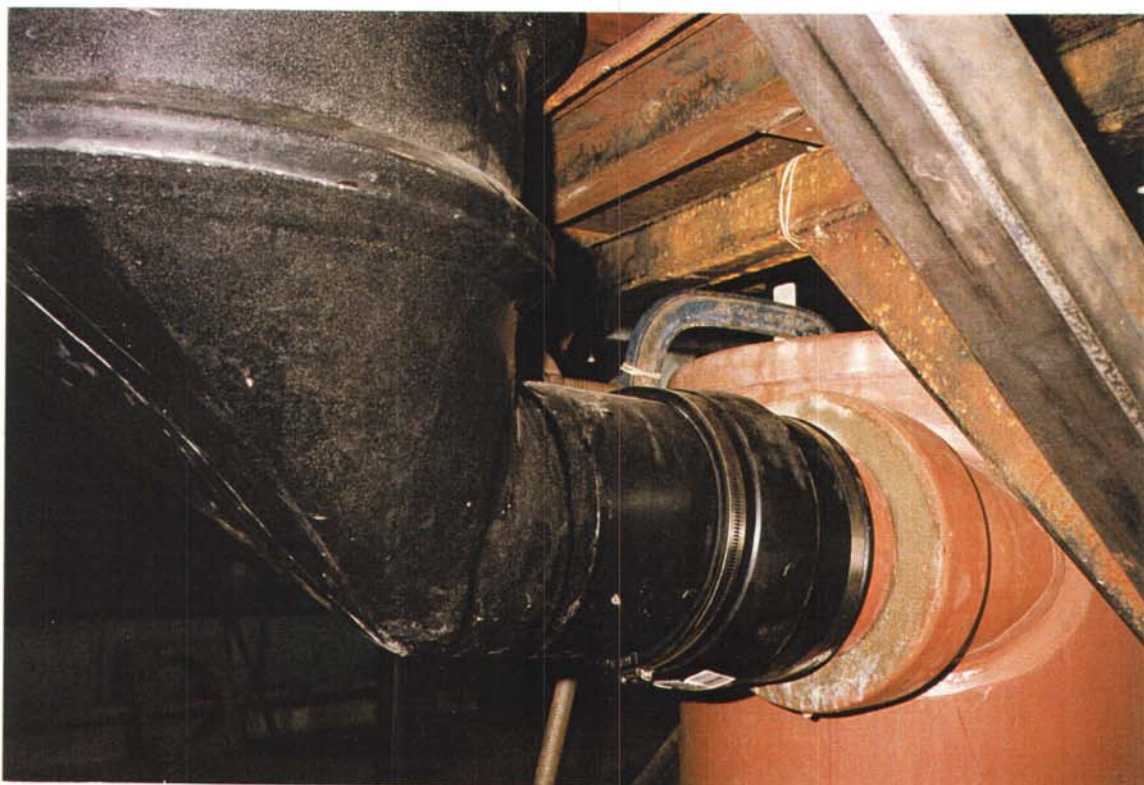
Clay pot, swirl design showing gully chute and short inlet tube
